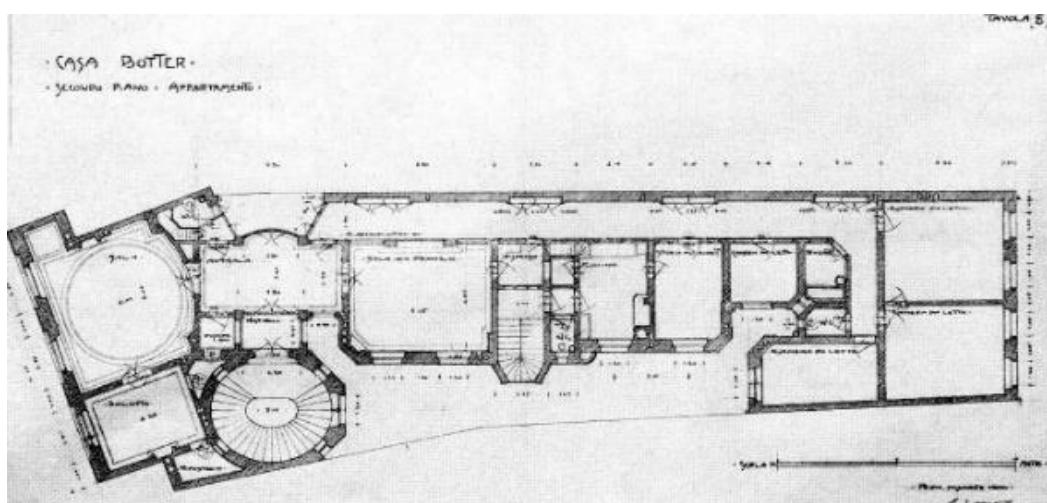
Plan of the Botter Apartment Building (Archivi Degli Architetti).
